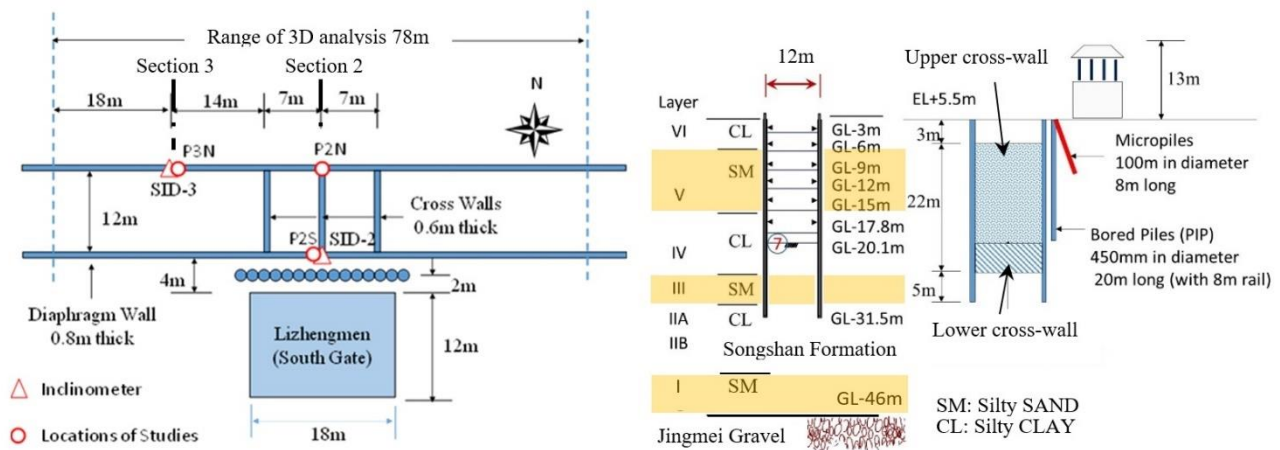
Layout and cross-section of the cross-walls for protecting Lizhenmen and locations of interest
